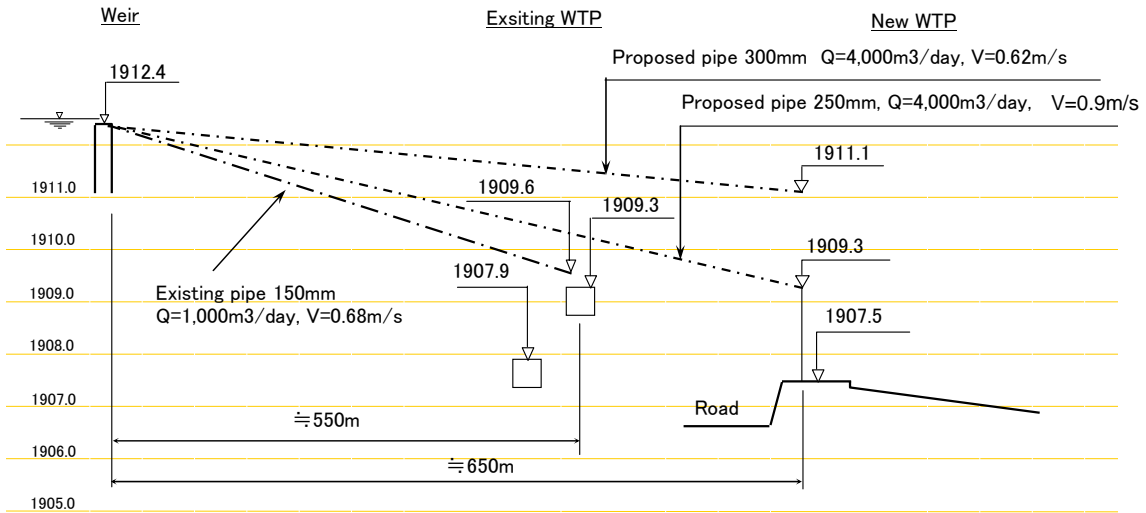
Water Level of Intake Weir and Existing/New Water Treatment Plant
